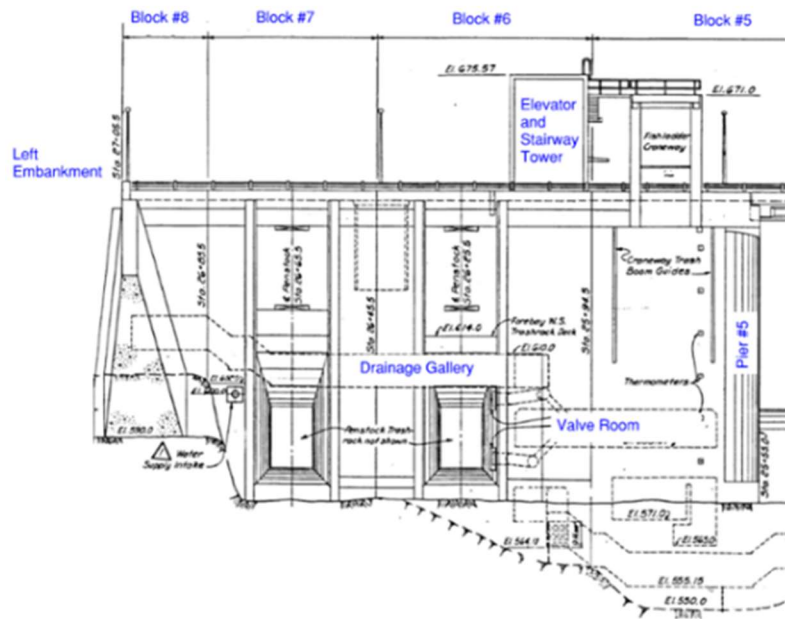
Concrete non-overflow components of dam looking downstream. Adapted from USACE, 1964.
